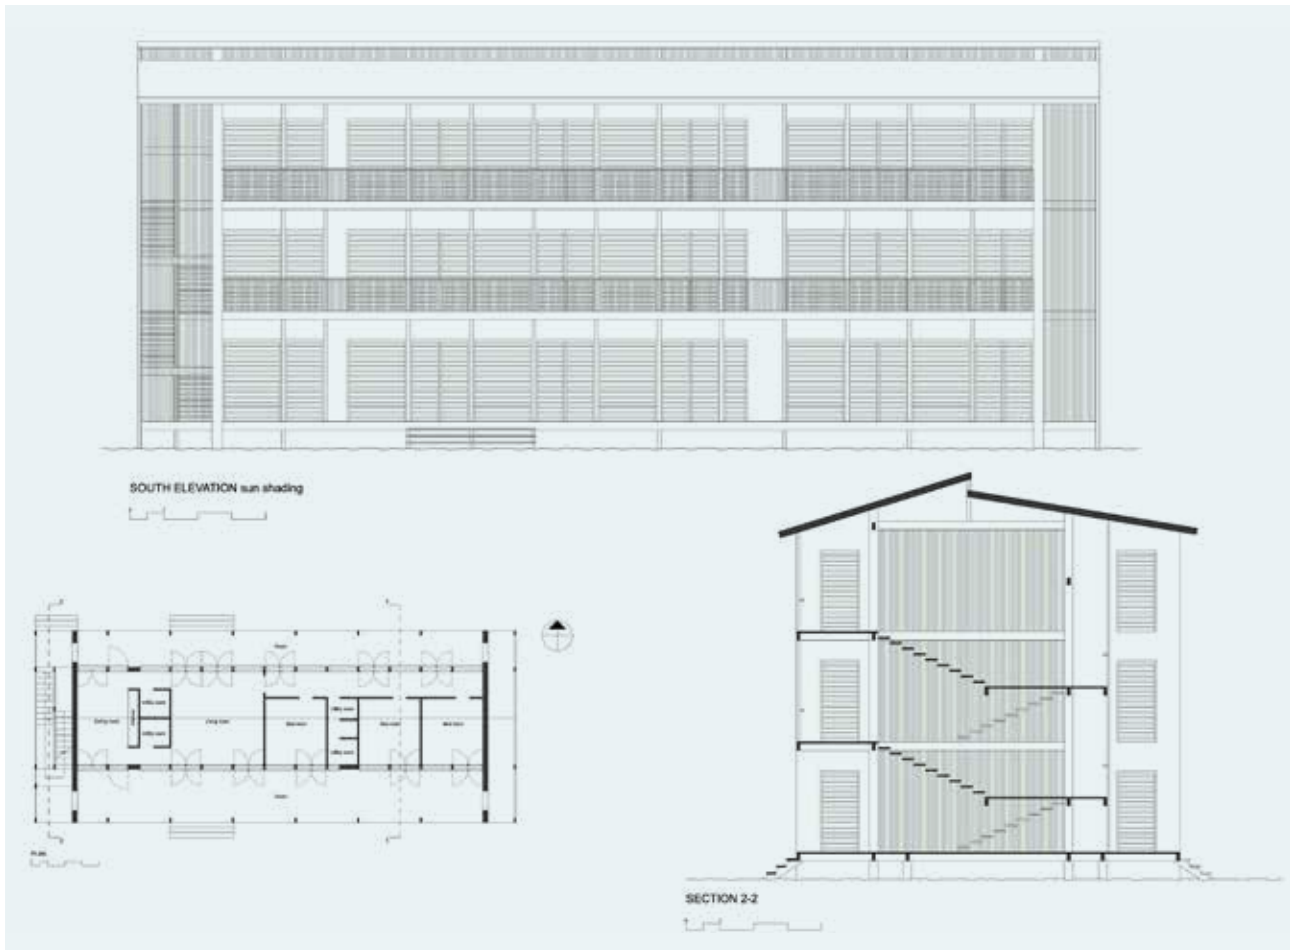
MULTI-STOREY SINGLE BANKED BUILDING – SECTION 2-2 AND SOUTH ELEVATION
